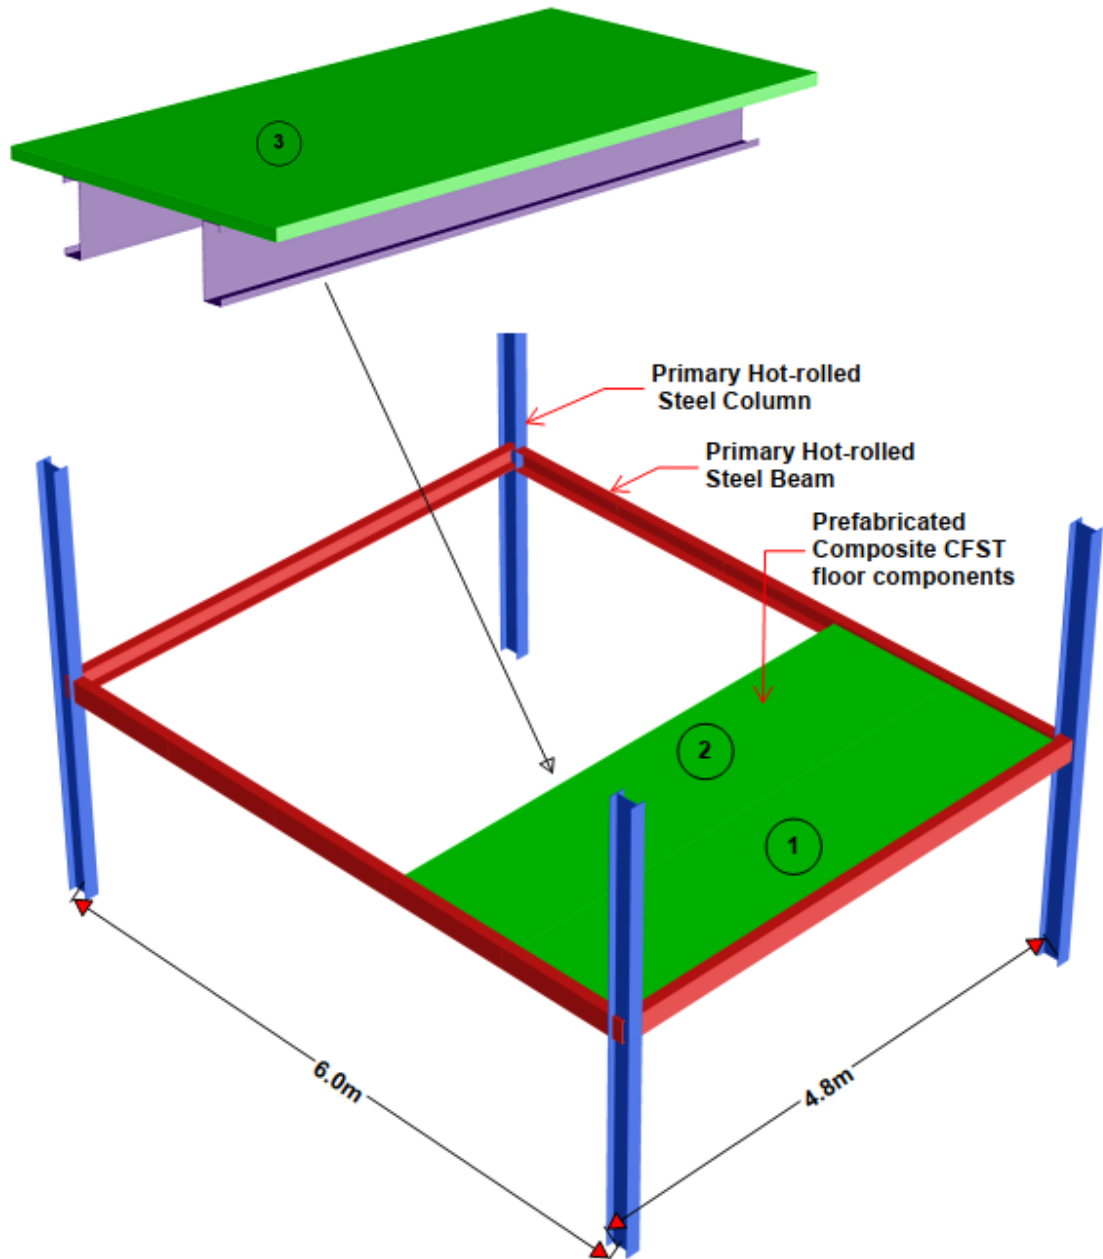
Typical reference construction system and sequence of assembly for prefabricated composite floor components
